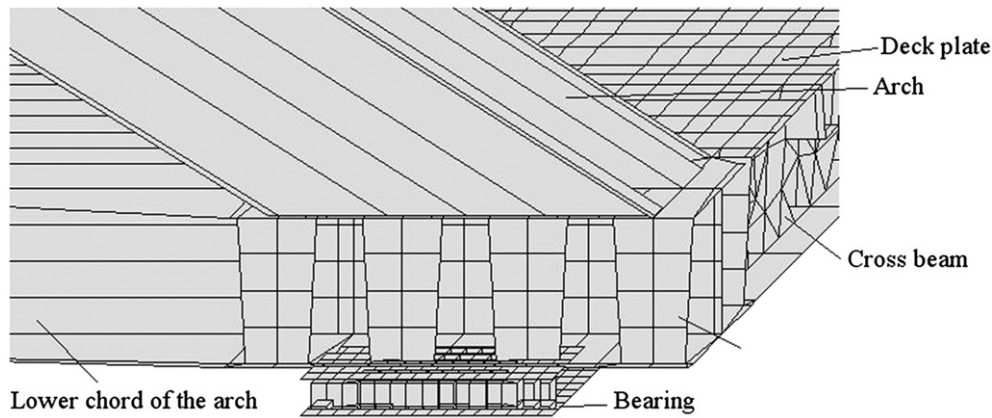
Detail of the arch springs in the finite element model of the Albert Canal Bridge.
